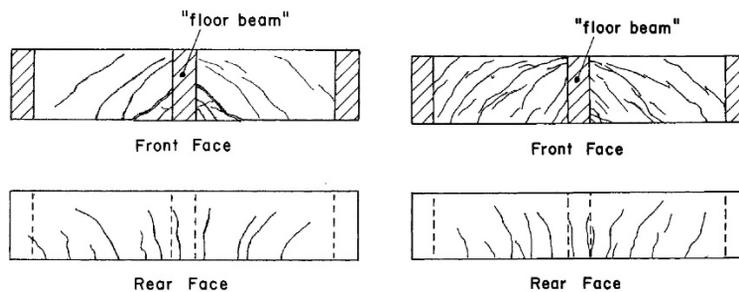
Cracking pattern of the supporting beam in specimens 5 and 2 [7]
